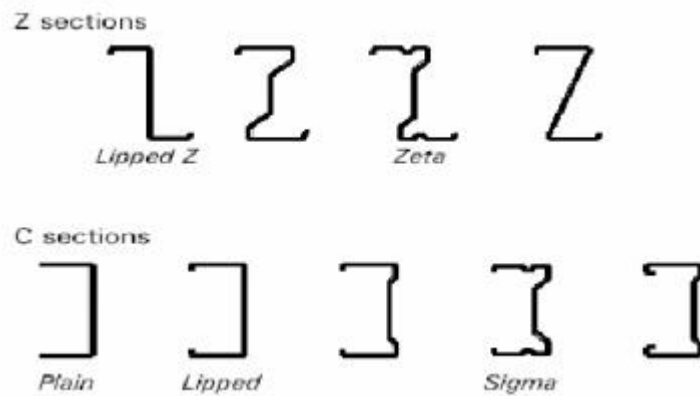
Common shapes for cold formed steel (C and Z section)
